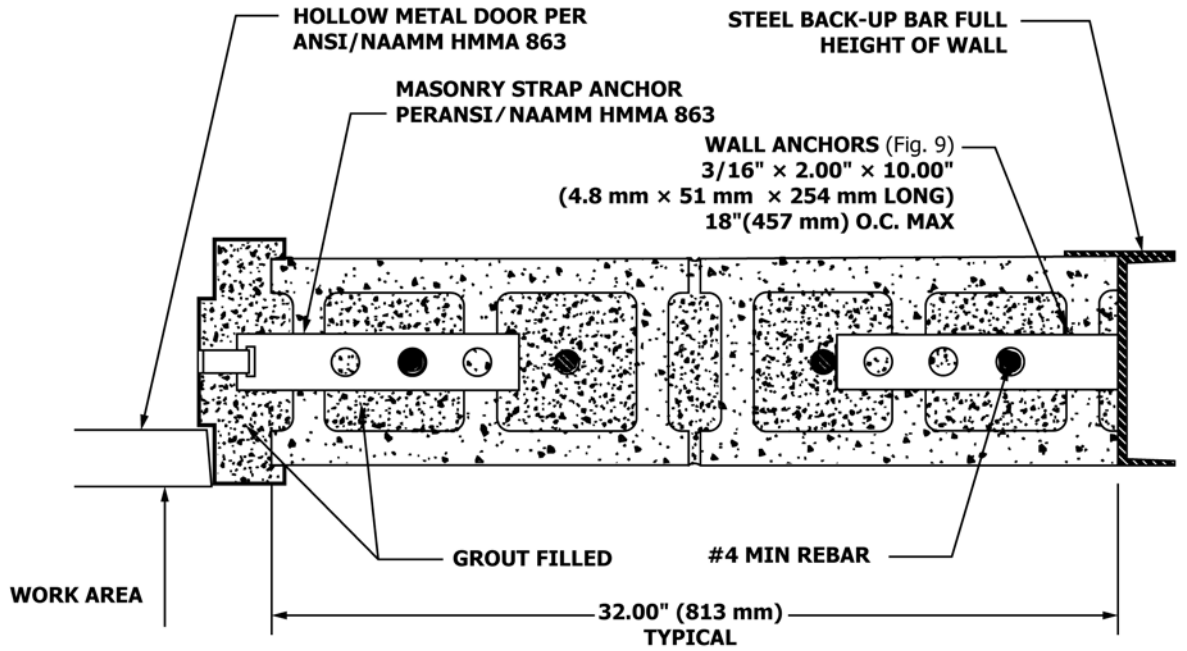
Section B-B HMMA 863 Type Masonry/Concrete Anchors
